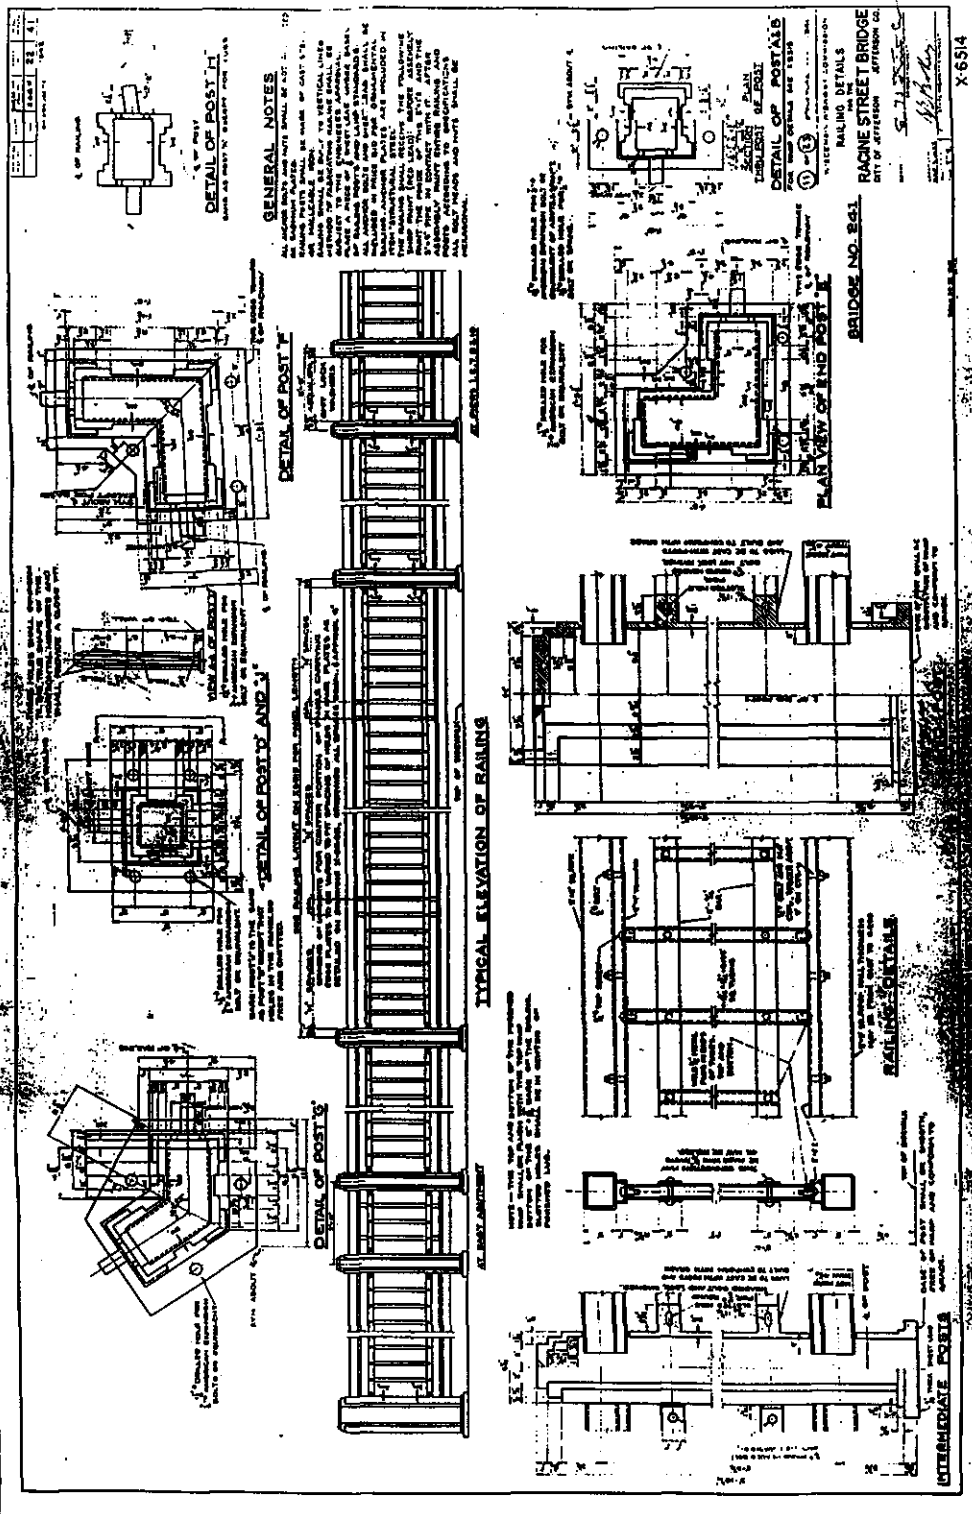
Wisconsin State Highway Commission, "Railing Details for the Racine Street Bridge," X6514.
